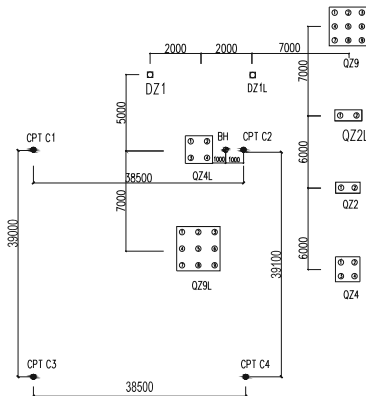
Layout plan of test piles and pile groups (all dimensions in millimeters).
